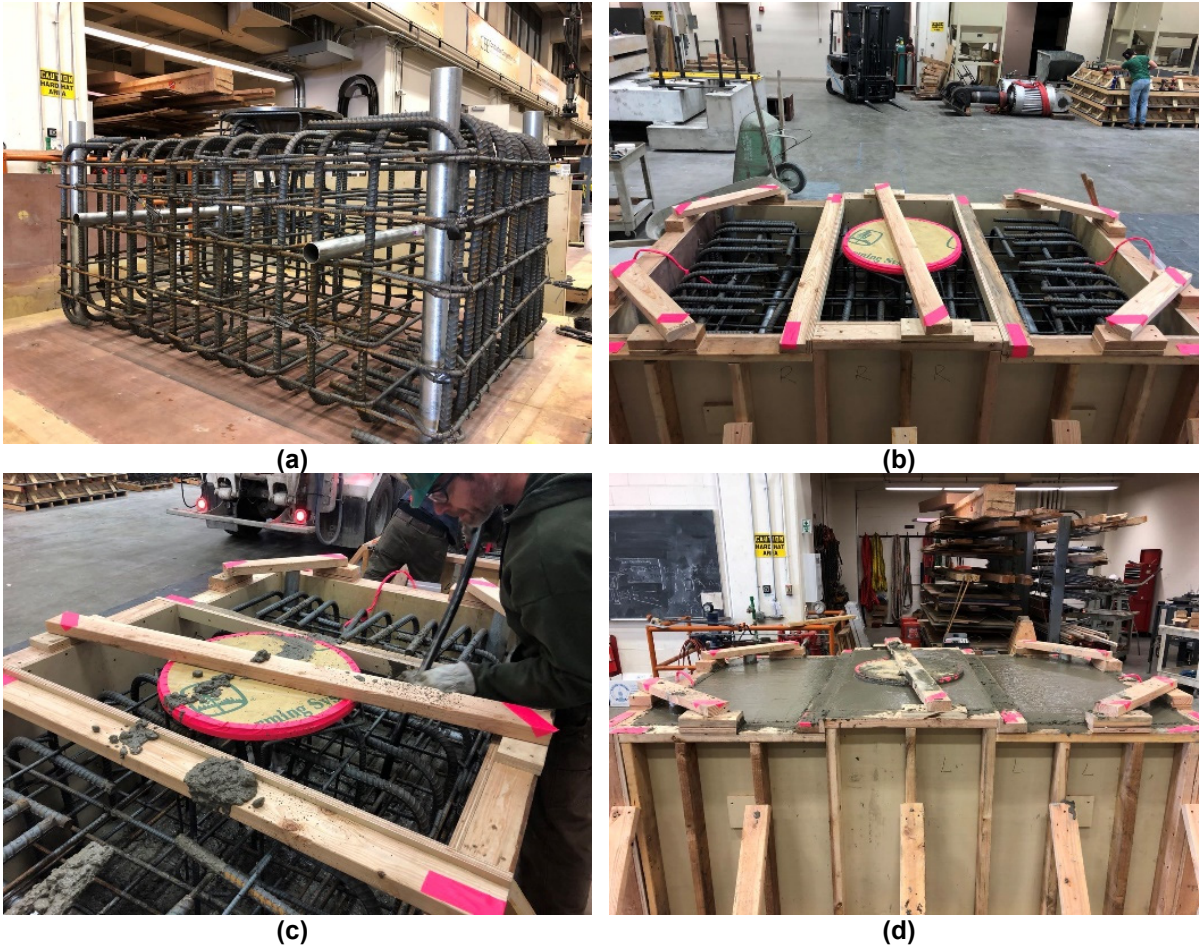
(a) Reinforcing bar cage; (b) formwork; (c) concrete casting; and (d) finishing state of the bottom block.
